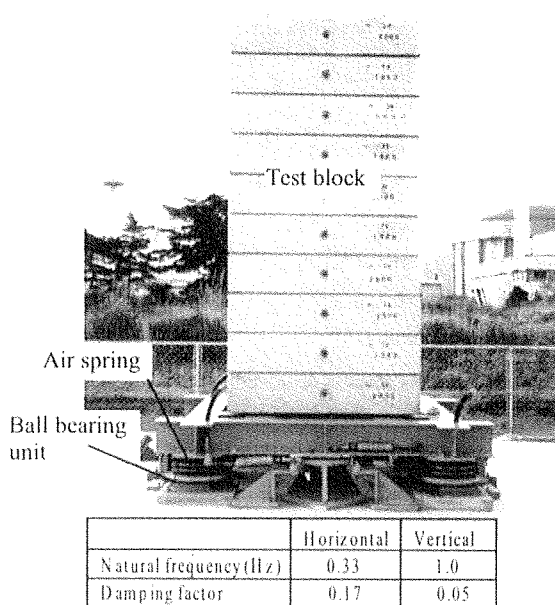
Three-dimensional base isolation test system using ball bearings and air springs installed on the field
